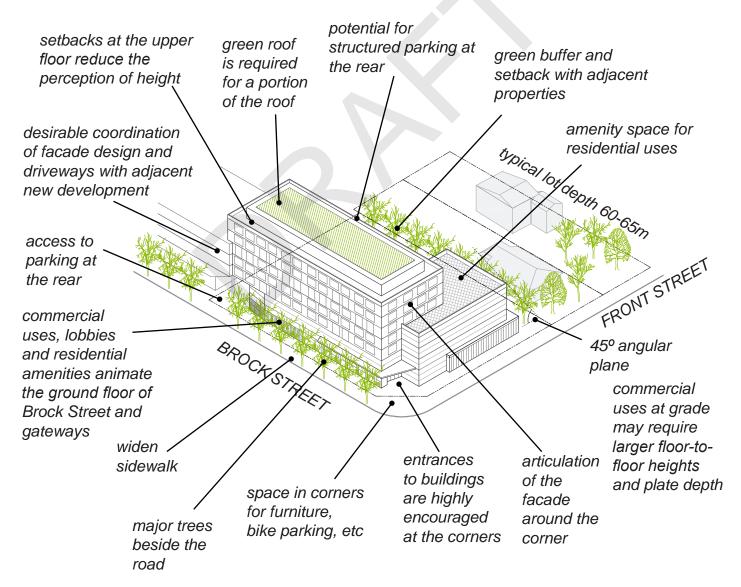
Demonstration Plan for potential redevelopment of corner lot
